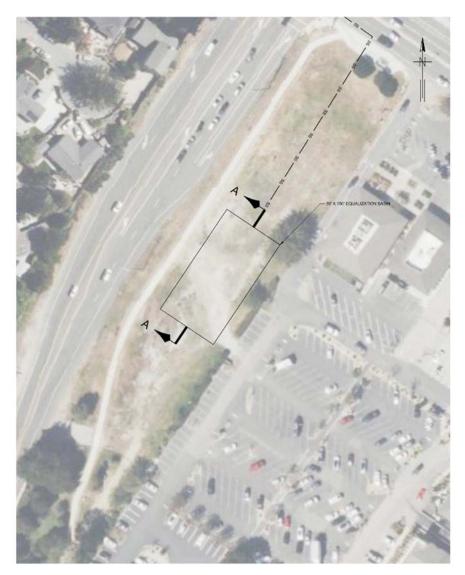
Site Layout of EQ Basin at Hatton Canyon Park for Centralized WRRF
